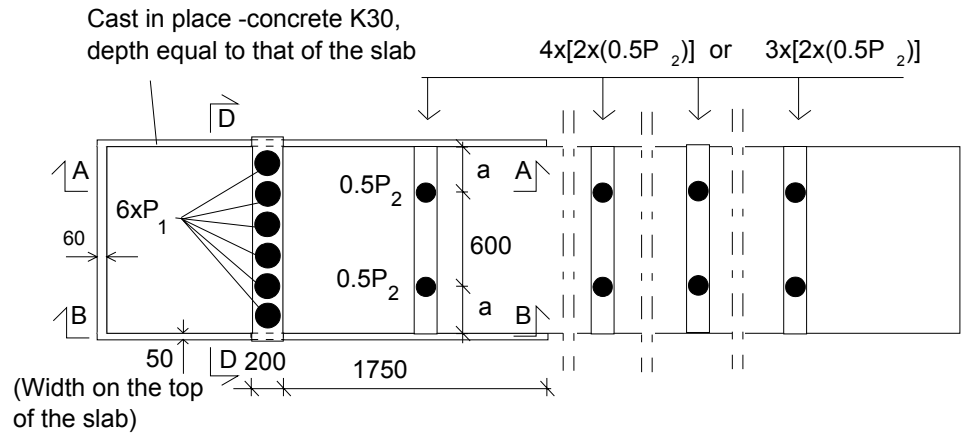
Plan view on loading arrangements and cast-in-situ collar outside the slab elements. Sections A – A, B – B and D – D are presented in Figs 8, 9, 11, 12, 14 and 15.
